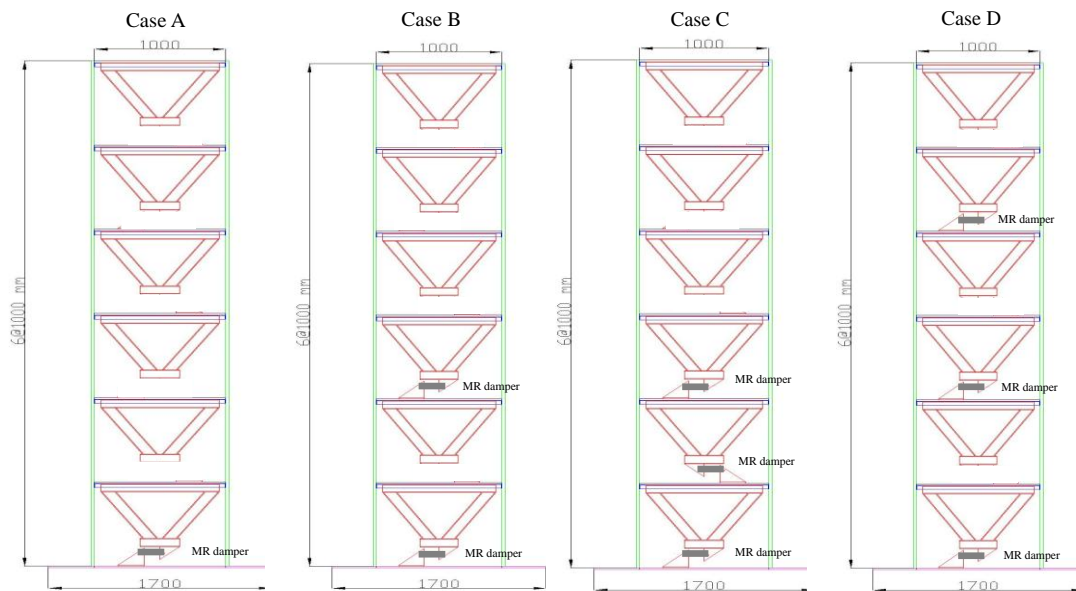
Four different cases of MR damper locations (layouts) in the test frame; (i) damper located on 1st floor, (ii) dampers located on the 1st and 3rd floors, (iii) dampers located on the 1st, 2nd and 3rd floors, (iv) dampers located on the 1st, 3rd, and 5th floors.
